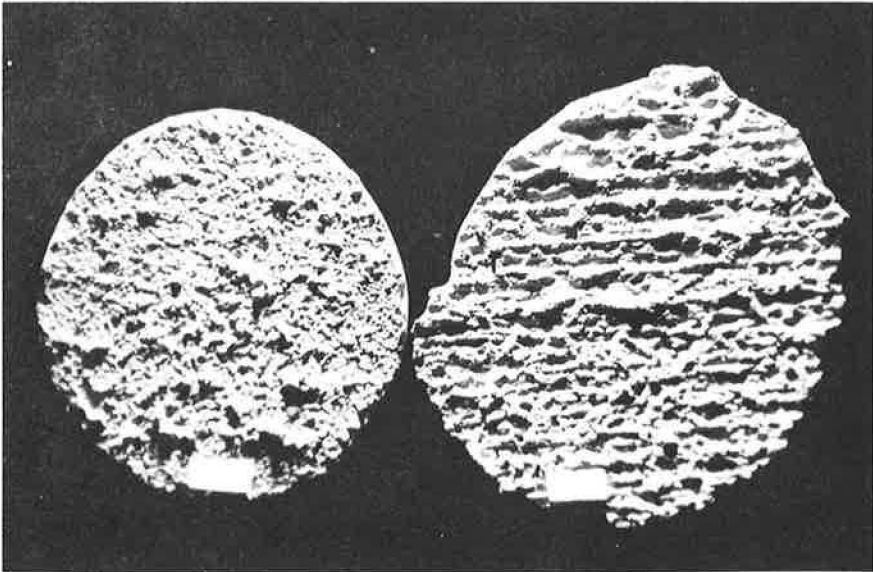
Plaster-of-paris casts of the surface of bituminous-concrete pavement before testing (left) and after 200 stop applications (right).
